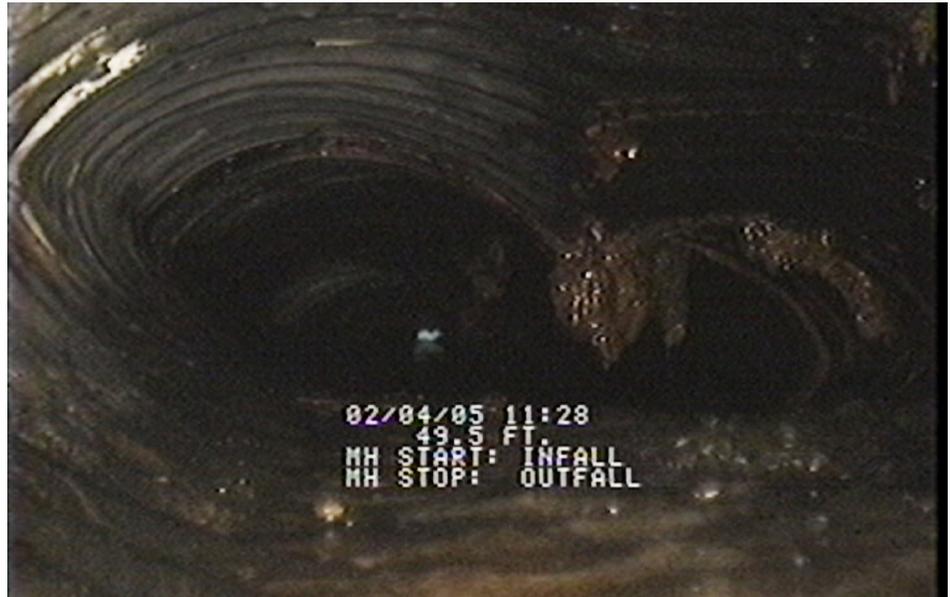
Inside the culvert looking upstream, 50 feet from the inlet, Road 1924 milepost 0.1.
